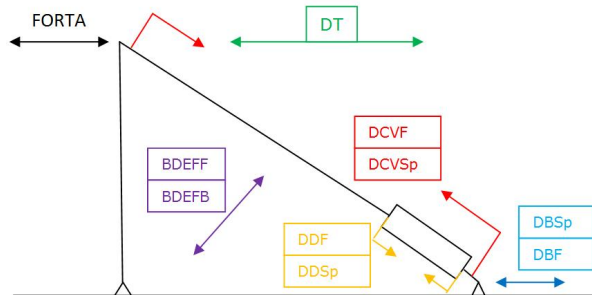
Measurement devices positioning scheme for HEA brace with damper experimental tests
